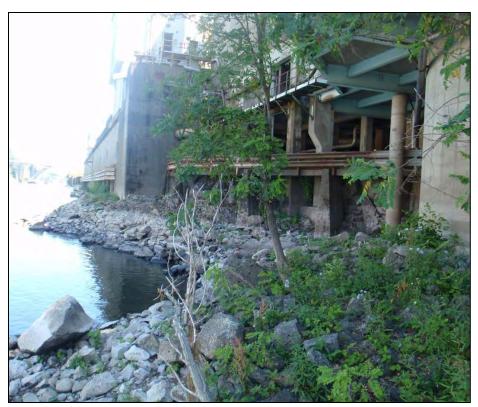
Shoreline showing pipe tunnel and associated buildings, looking downstream (08/03/2012).
